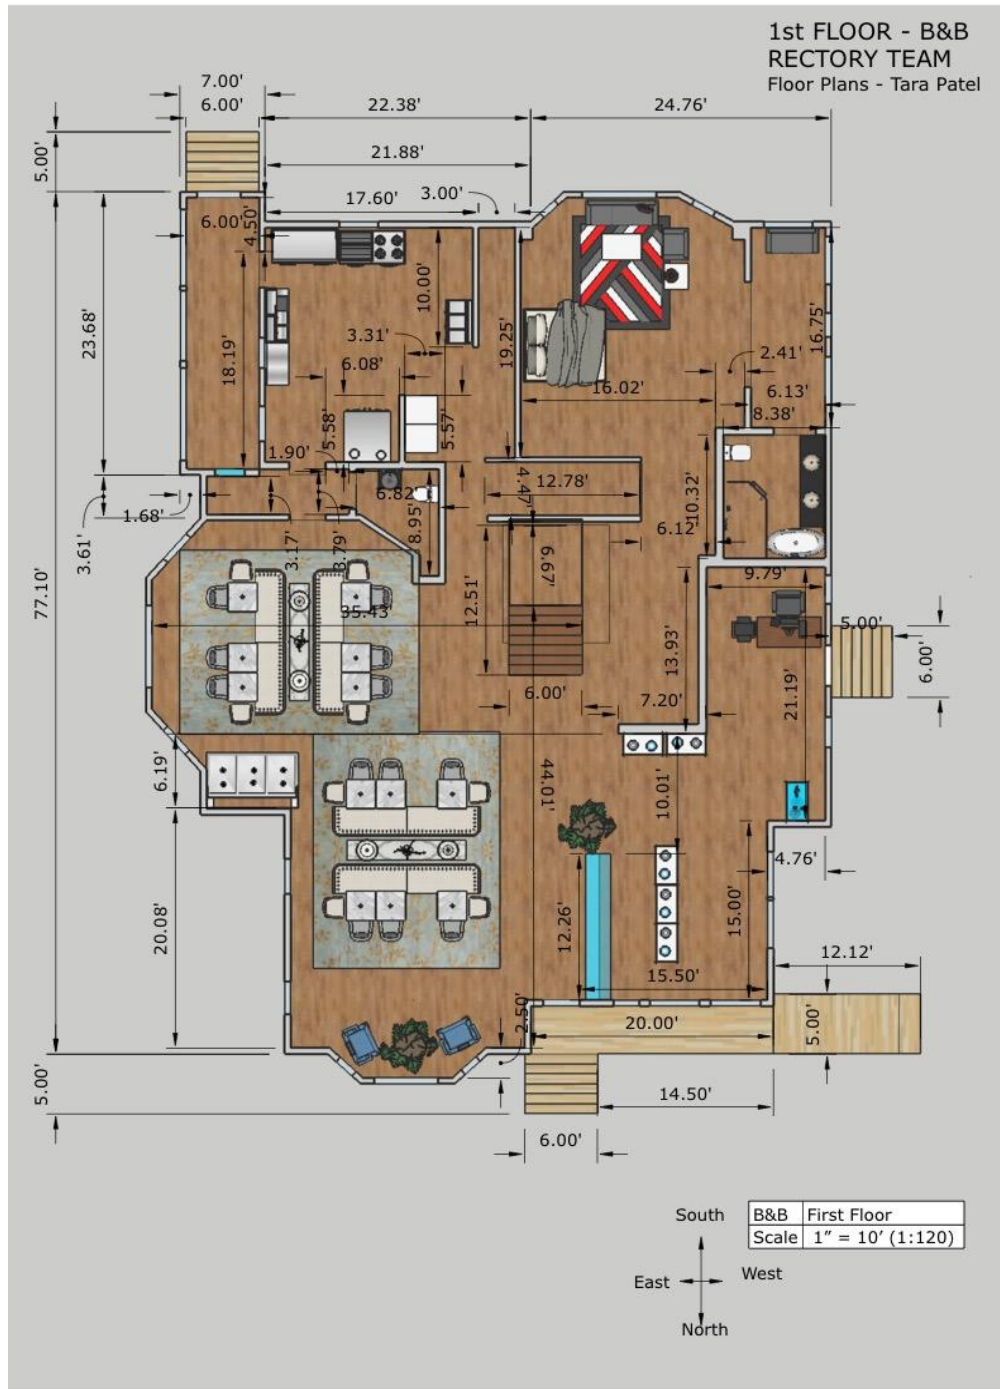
Floor plans of the main floor with the breakfast area, kitchen and laundry on the east (left) and the reception, gift shop, office, and accessibility bedroom on the west (right) side. There are three egress points as well as a ramp for handicap access. [Not pictured: stairs to the basement and small set of stairs to the second floor in the kitchen as well as the additional stairs to the second floor on the main staircase.]
